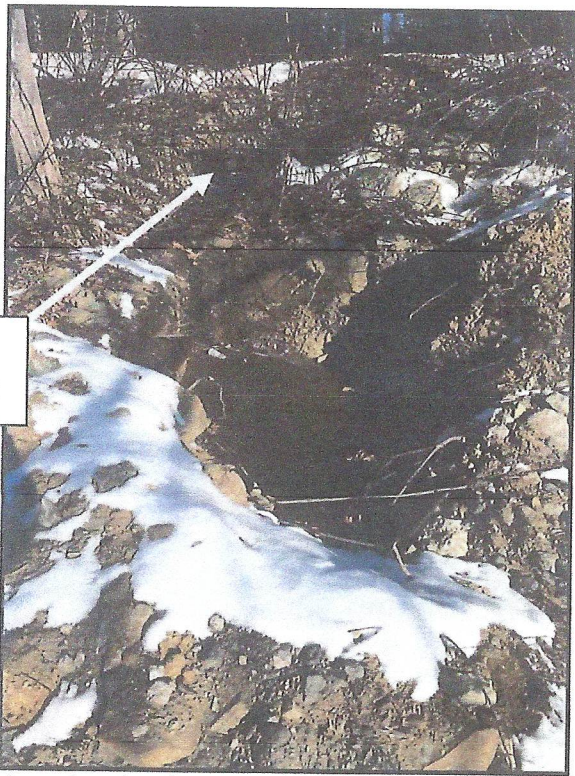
outlet pipe from Bungee Hill & “plunge pool”
